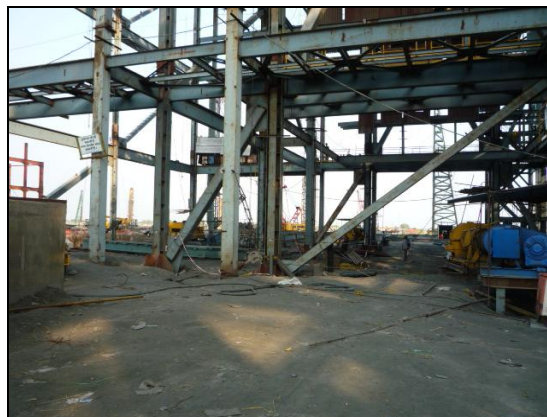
Units No.8/9 Boiler Building Foundation
